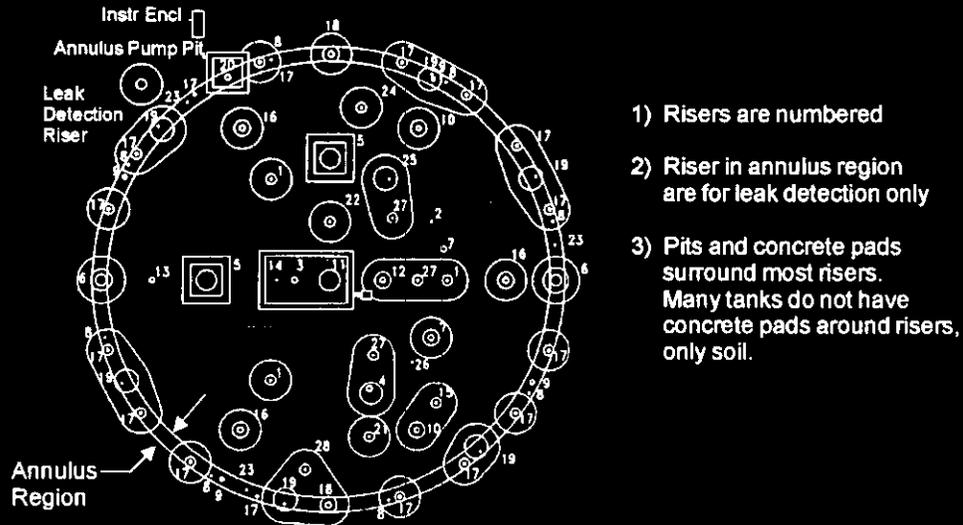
Typical Tank Construction and Dimensions (AP Tank Farm).
